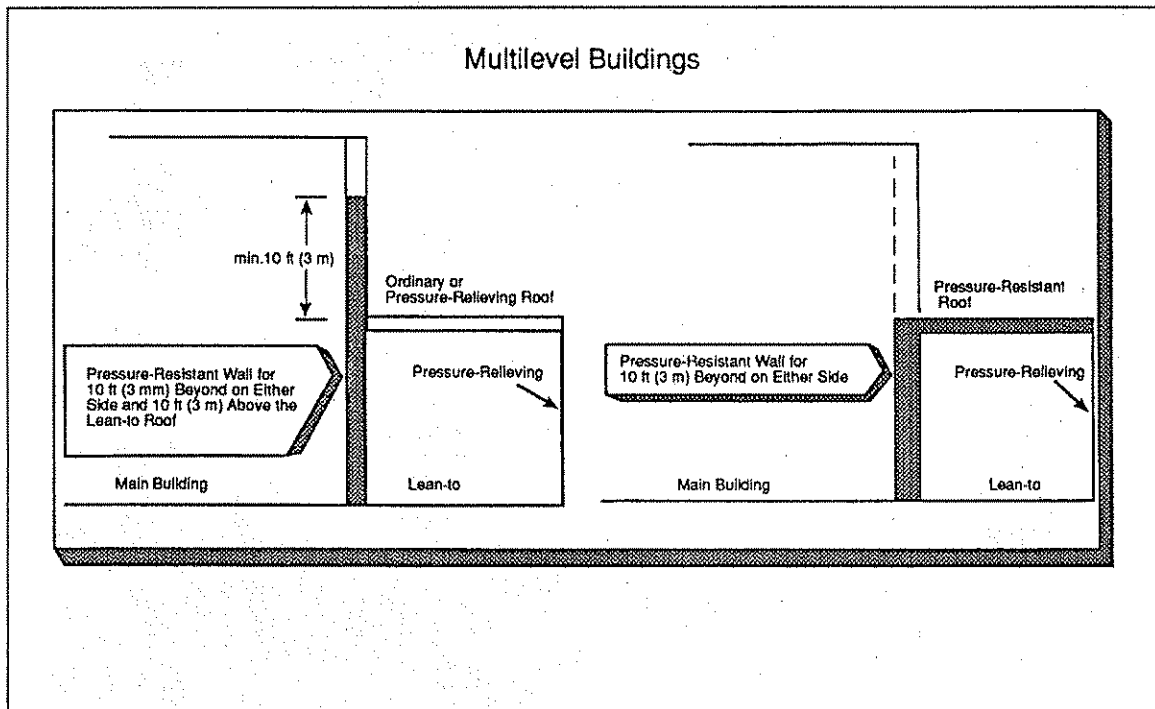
Construction details for lean-to with damage-limiting construction.
